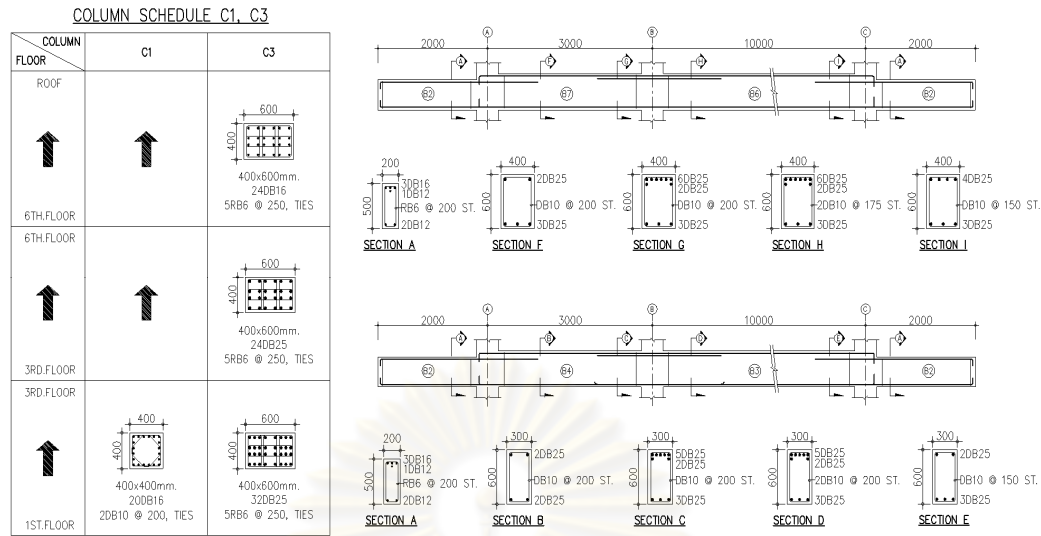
Cross section of all beams and columns. All dimensions are in millimetres. “DB” denotes deformed bar, whereas the following number indicates the diameter of rebar in mm.
